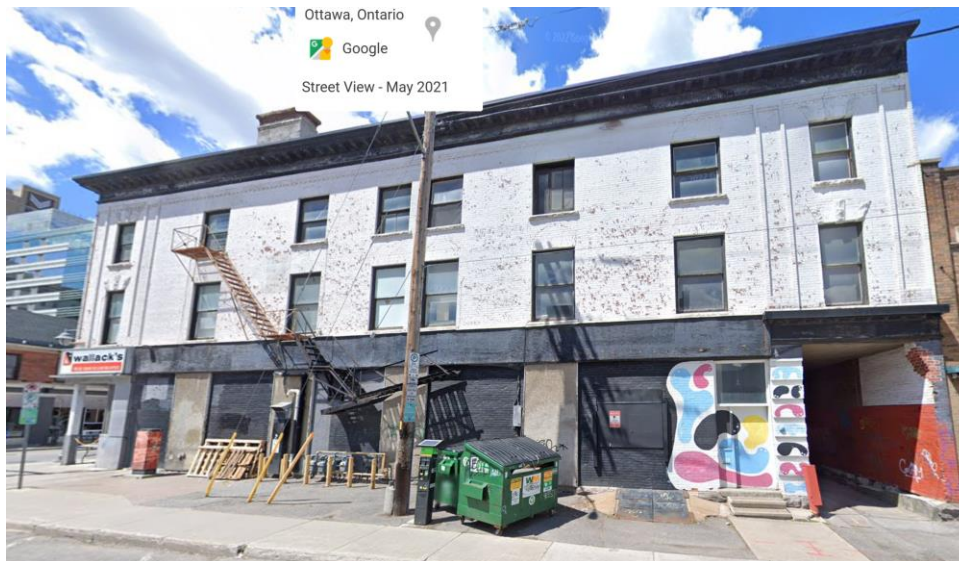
The south elevation of the 231 Bank Street. The ground floor windows have been removed and panels added.
